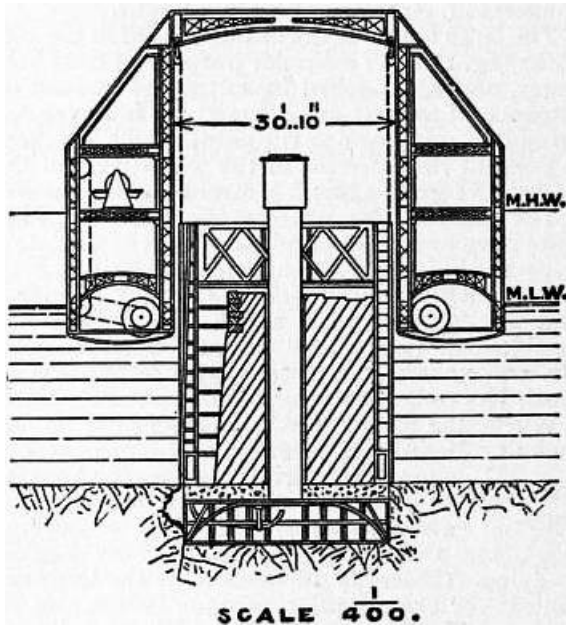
Antwerp Quay Wall, founded by compressed air.
